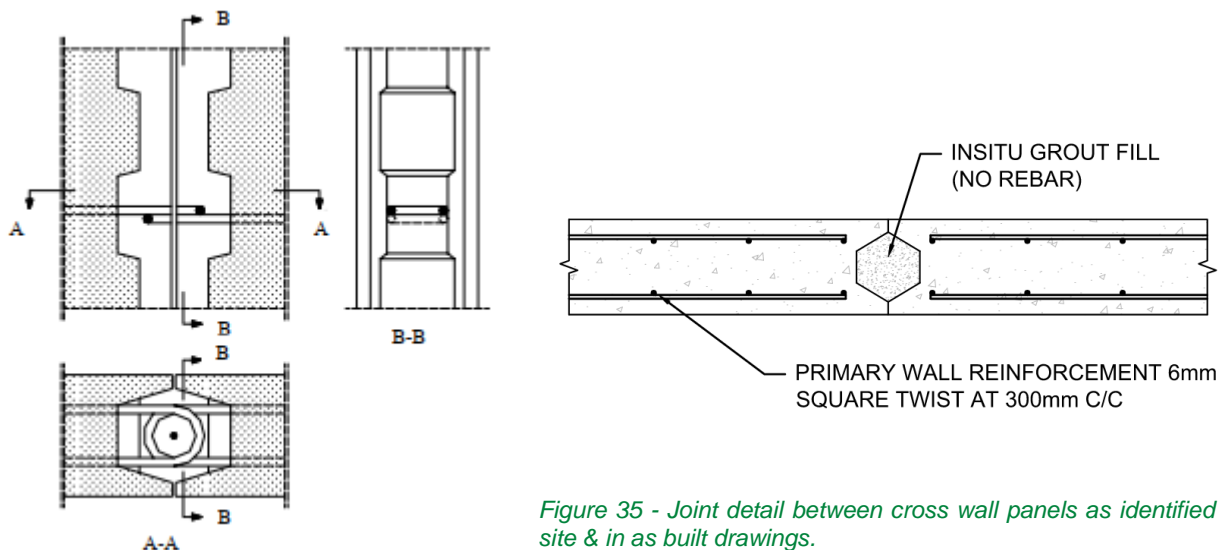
Typical shear key connection at a vertical joint between wall panels
